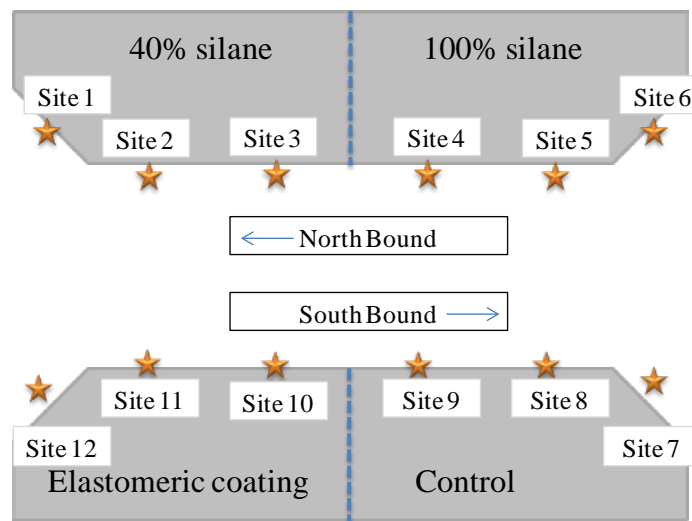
Treatment plan and monitoring sites (PMP) for the structures along Post Road in Warwick, RI.
